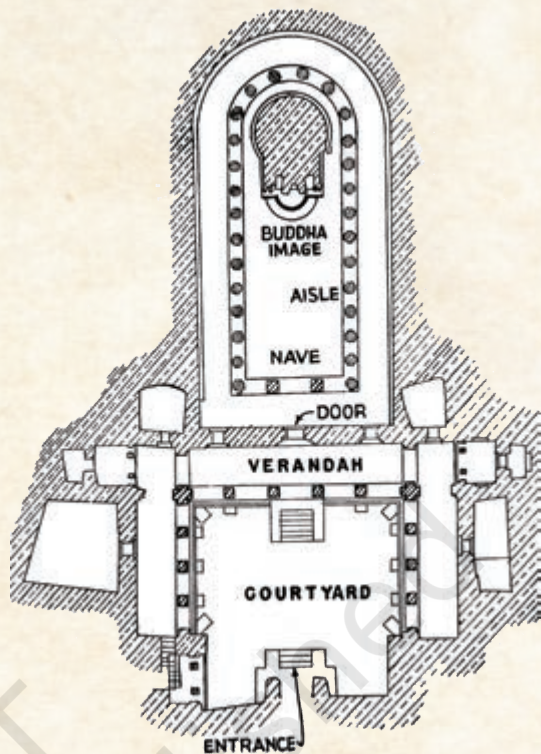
A ground plan of cave no. 10 at Ellora
